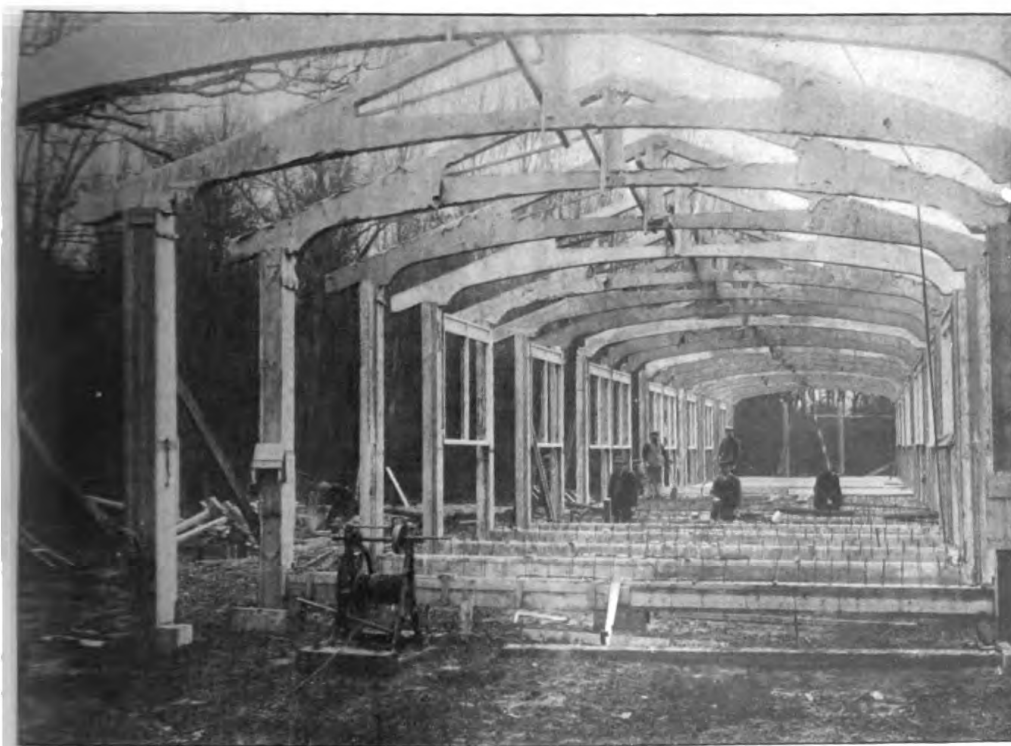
Construction of concrete ward. Supports for roof and floor in place.
